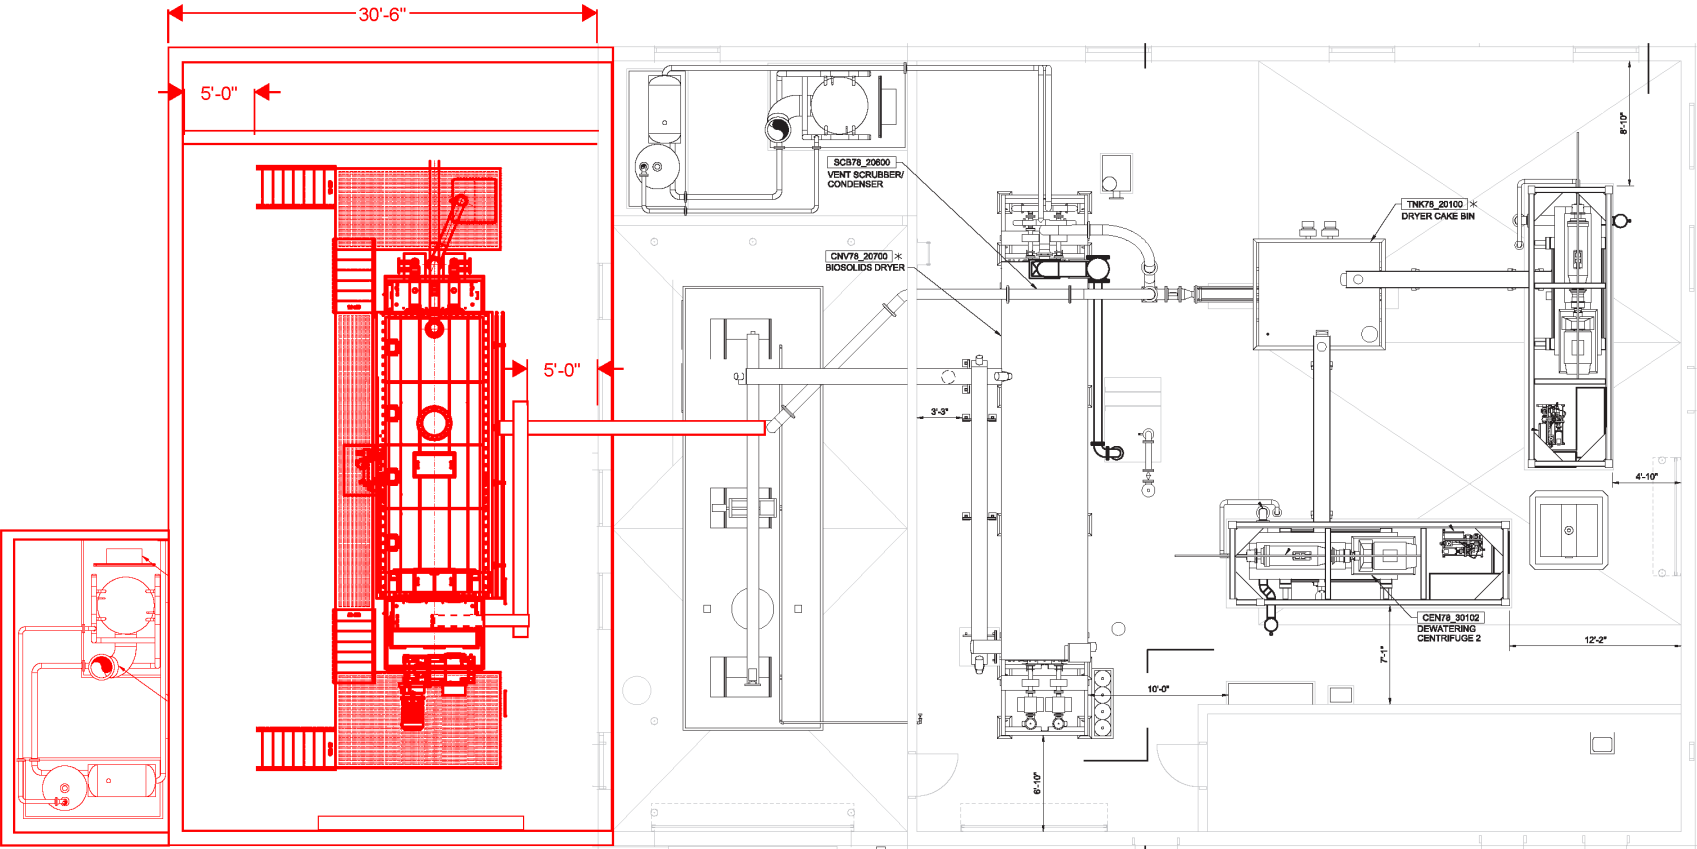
Dewatering and Dryer Building Expansion for Redundant Solids Paddle Dryer
